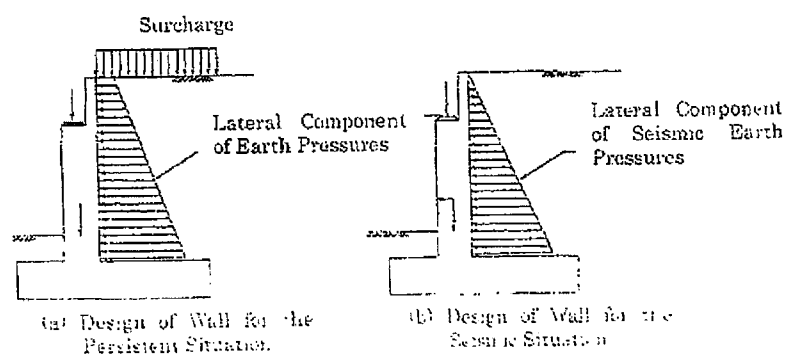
Design of Wall for the Persistent Situation and Seismic Situation
